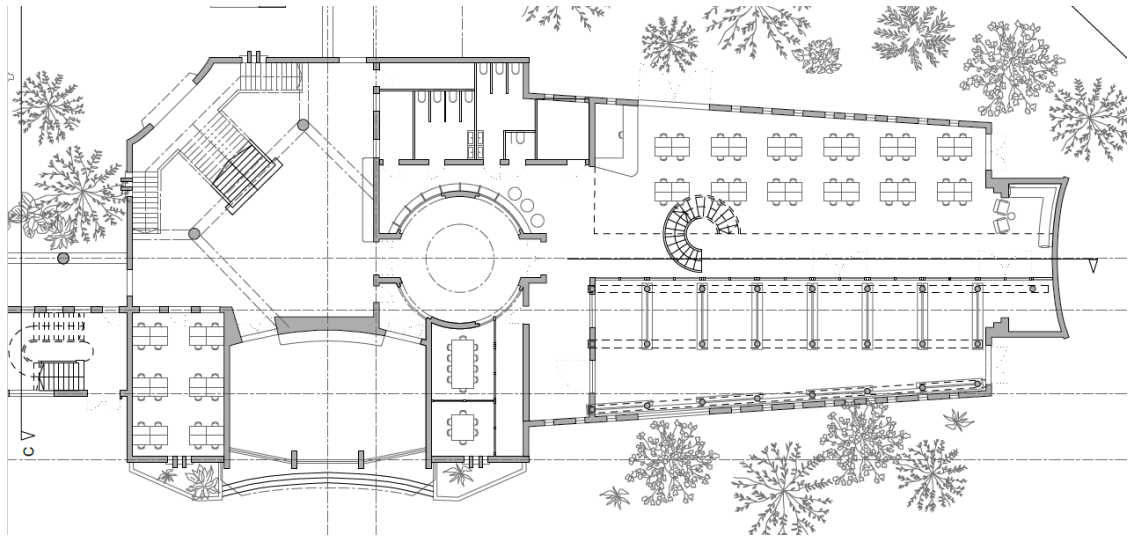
The library, ground floor plan, with the deployed patterns labelled: 1. Majaz, 4. Kabishkan, 6. Inward-facing, Talar, 9. Tarma (first floor), 10. Hosh, 22. Sun-tunnel openings (Source: by author).
